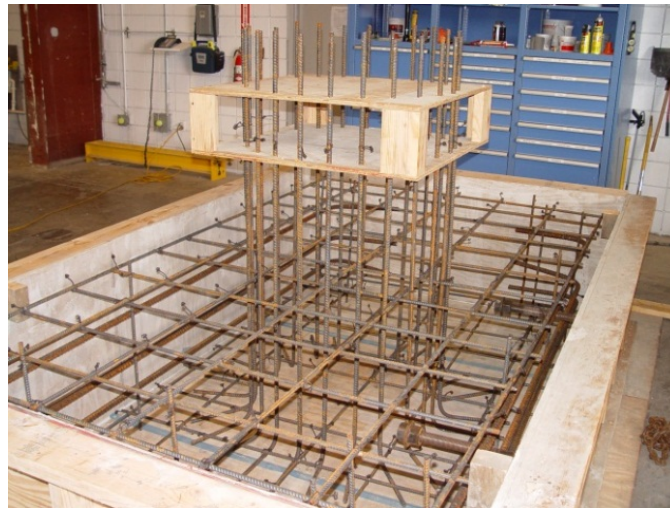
Reinforcement cage for the concrete block. Photo courtesy of FDOT.
